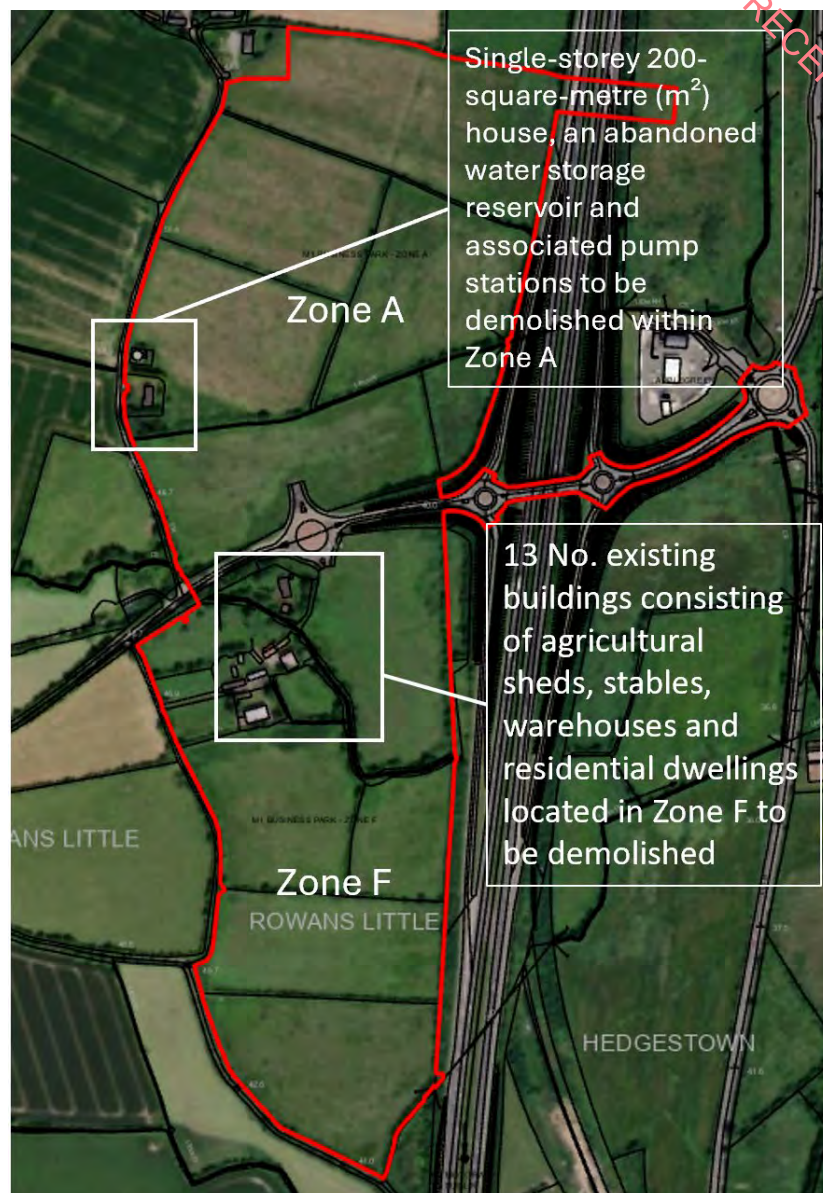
Existing Building within Zone A and Zone F to be demolished.
